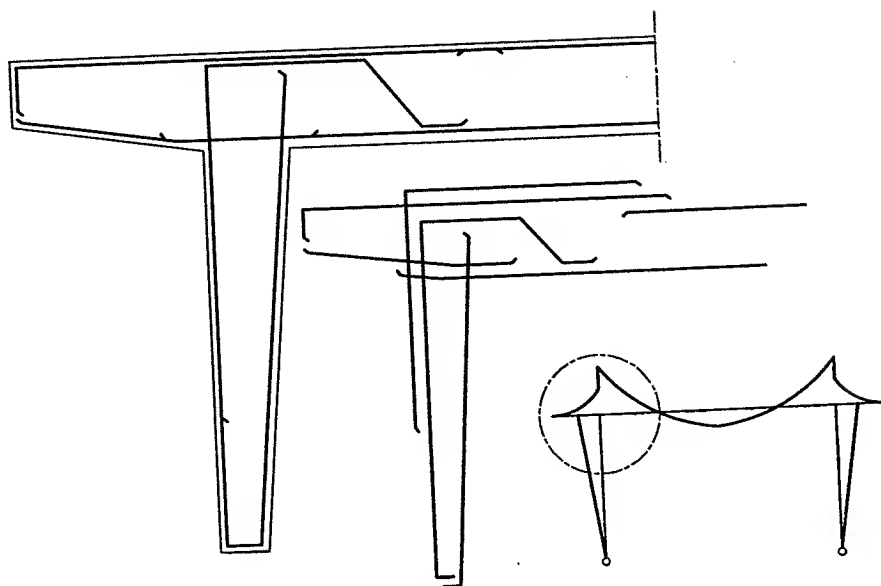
Detailing of Frame Joints (Detail-5)
